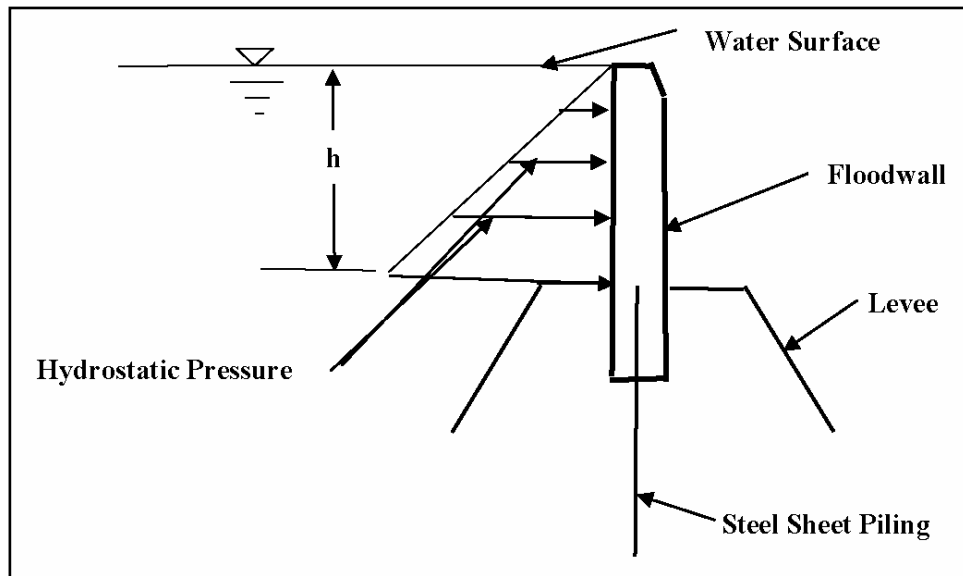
Definition Sketch for East Floodwall at Imminent Overtopping Condition
